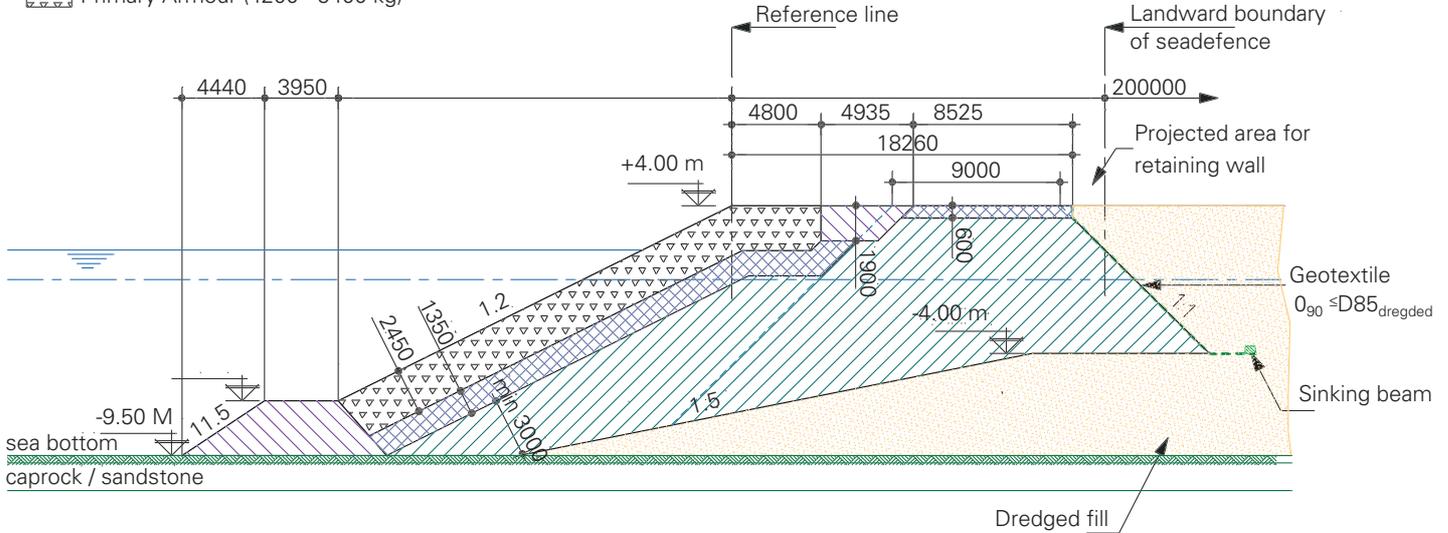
Typical cross section for Section I (4,750 m – 7,700 m).
